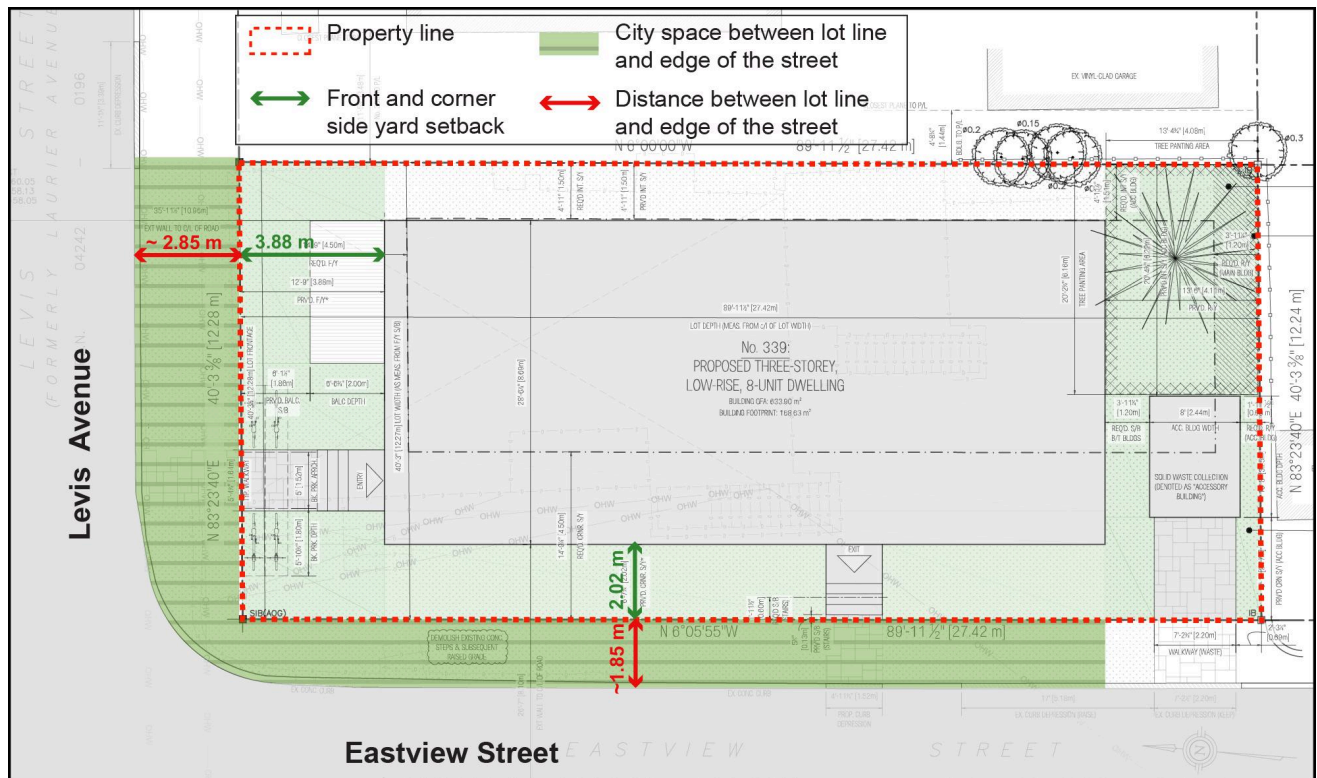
Corner side yard and front yard setback and City space illustrating the total ~3.87 m (corner side) and ~6.73 m (front) separation between the building facade and the street edge.
